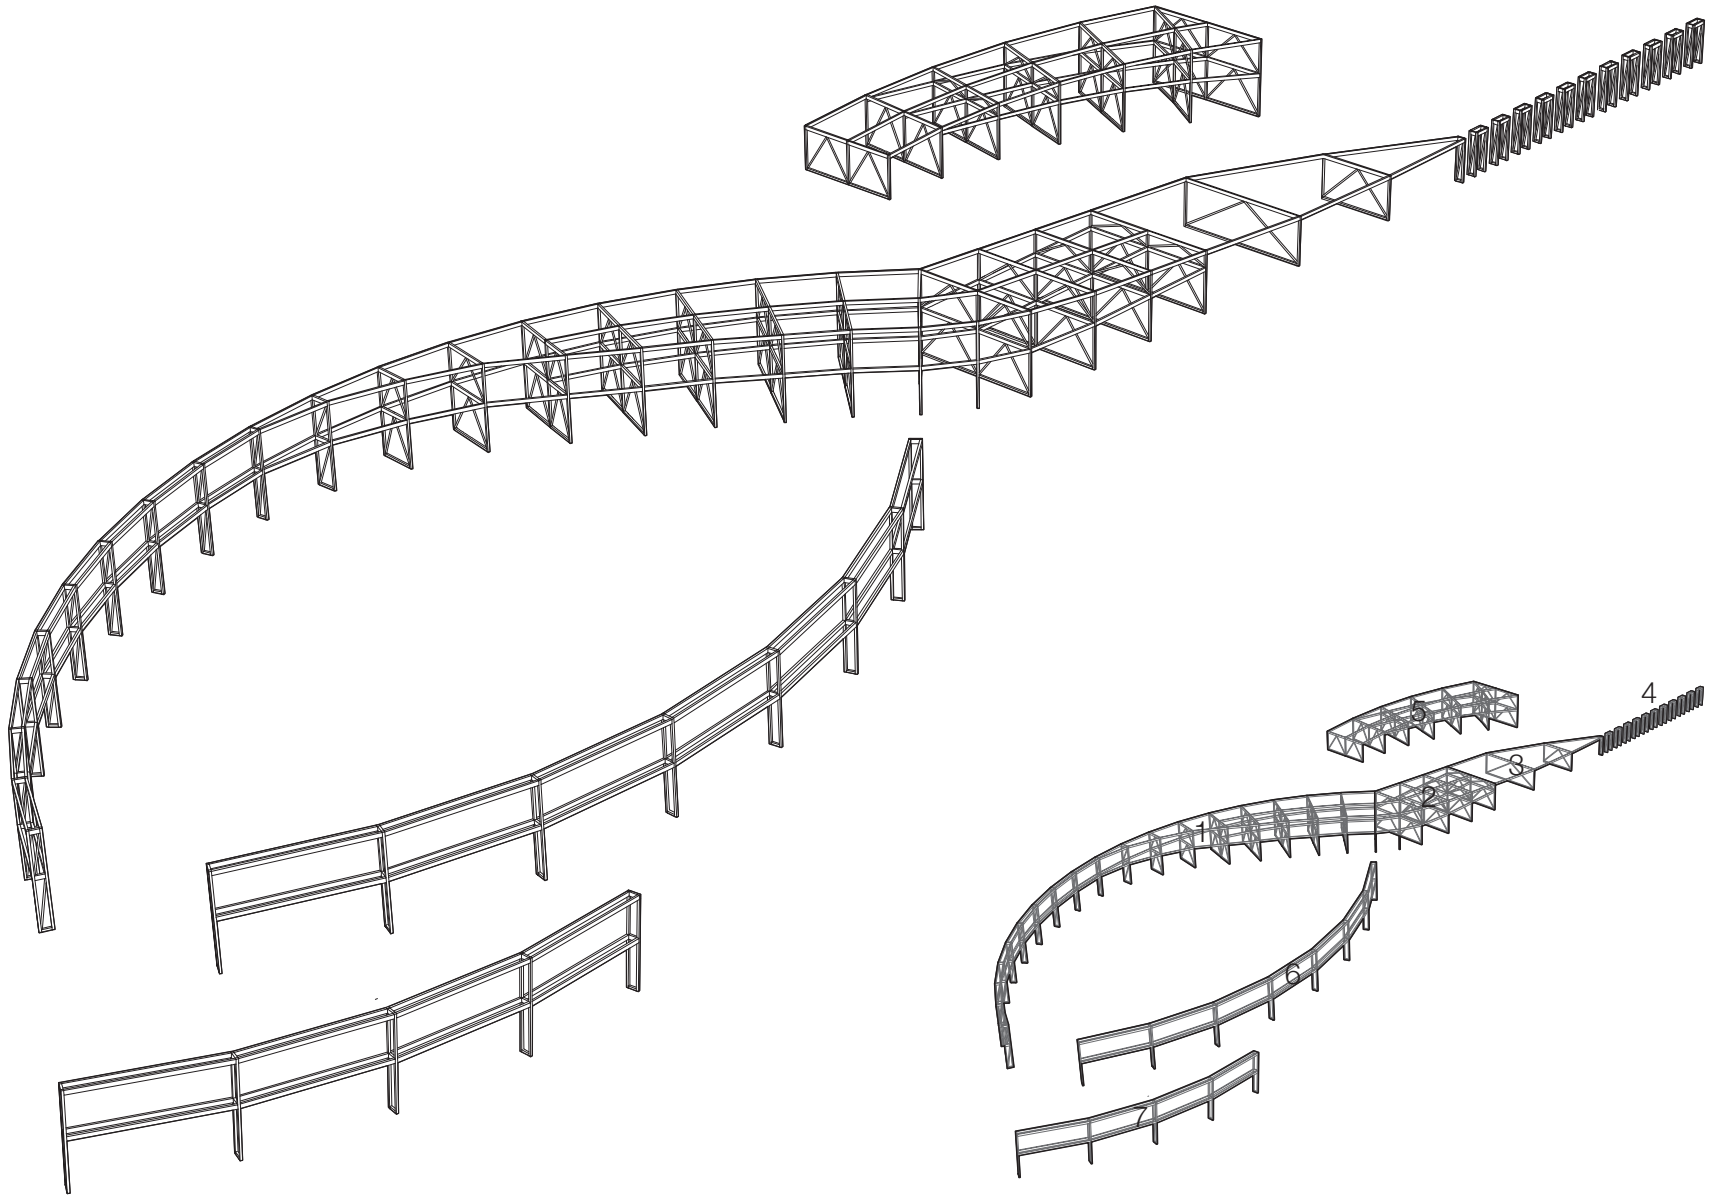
Schematic structural drawing (left) and pressure zones overlaid onto structural drawing (right).
